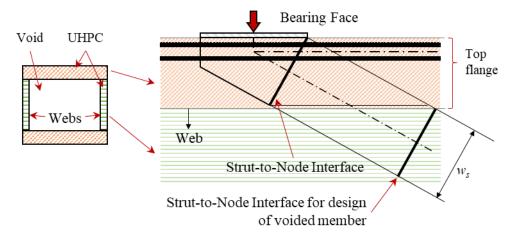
Illustration. Conservative strut-to-node interface plane to use for design of voided members.
